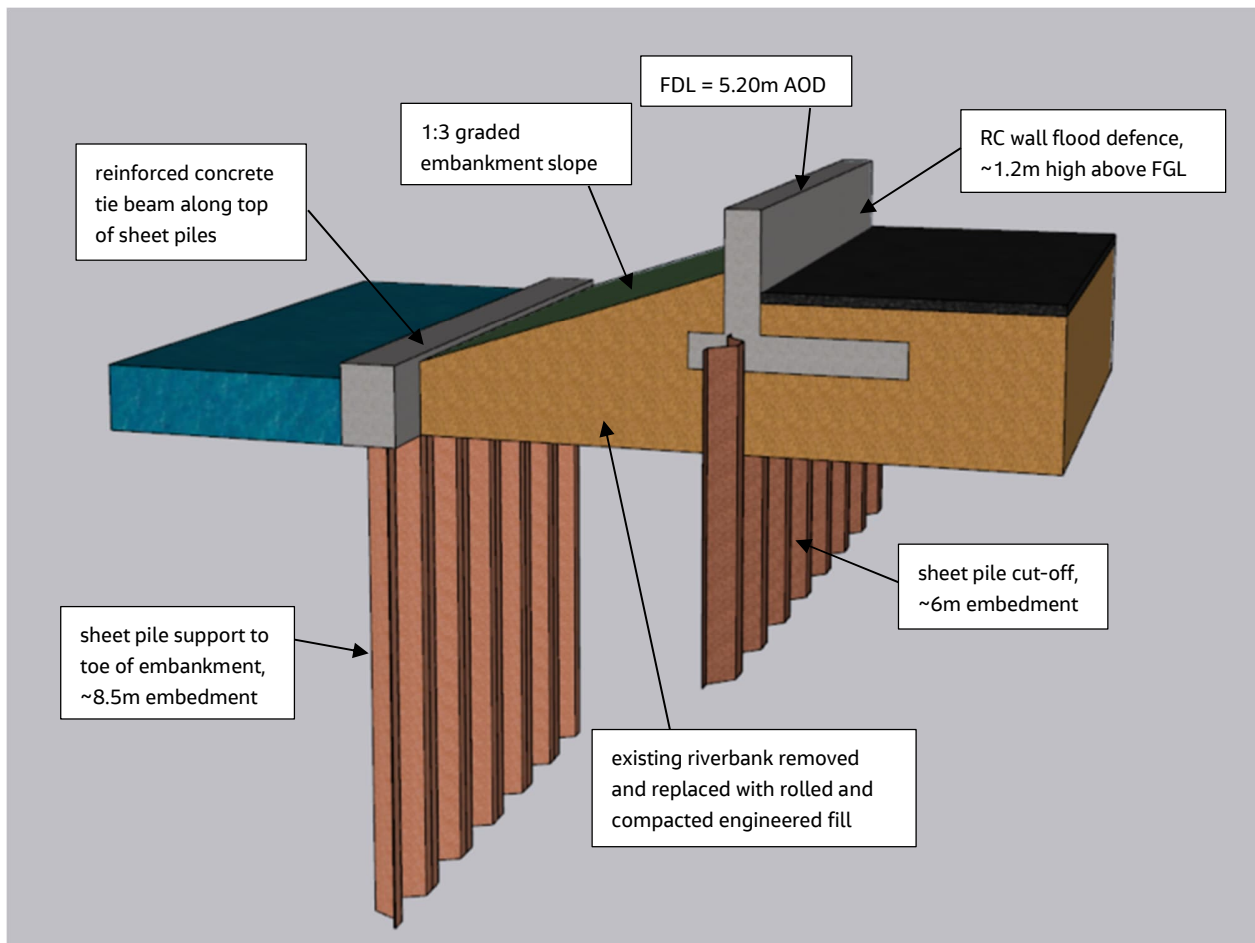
Option B2, RC cantilever flood wall with seepage cut-off and bank stabilisation
